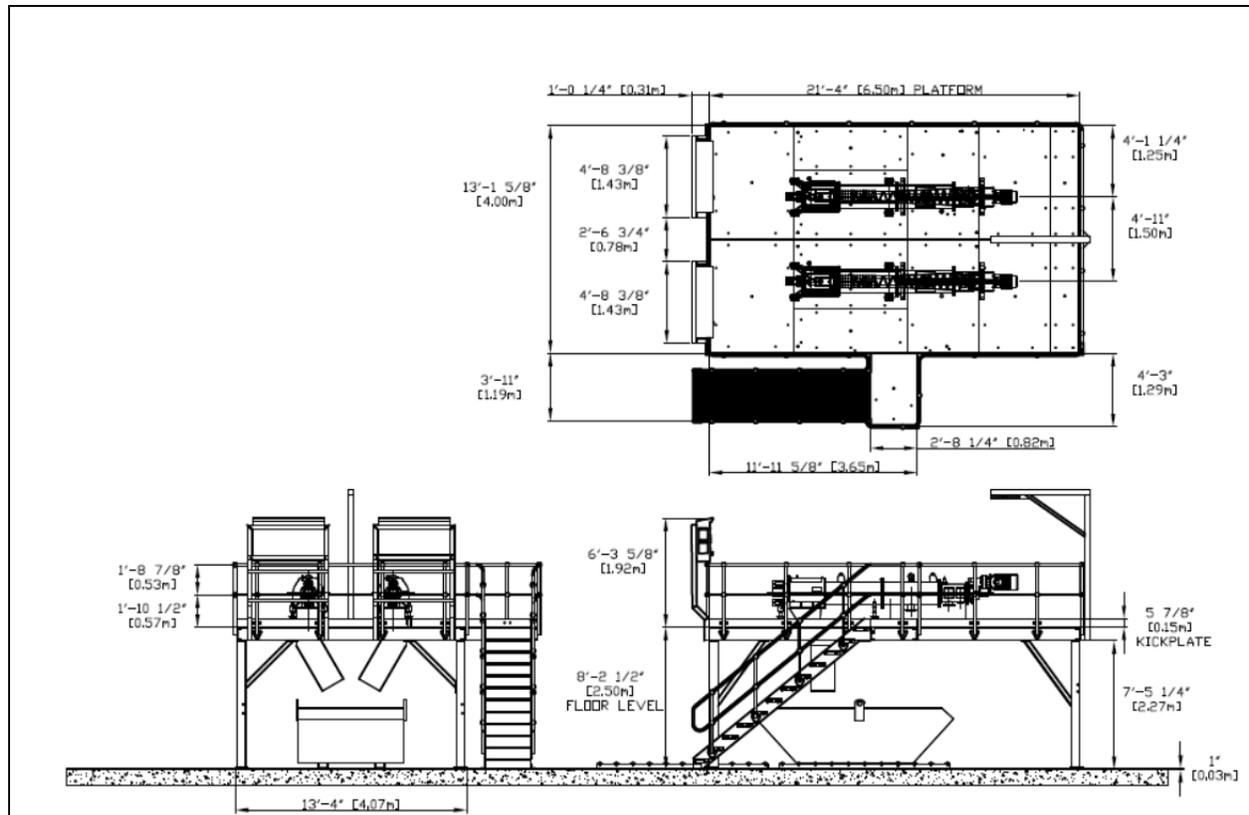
Typical Pre-screening Facility Layout (enclosure and odor control system not shown; image courtesy Hydro International).
